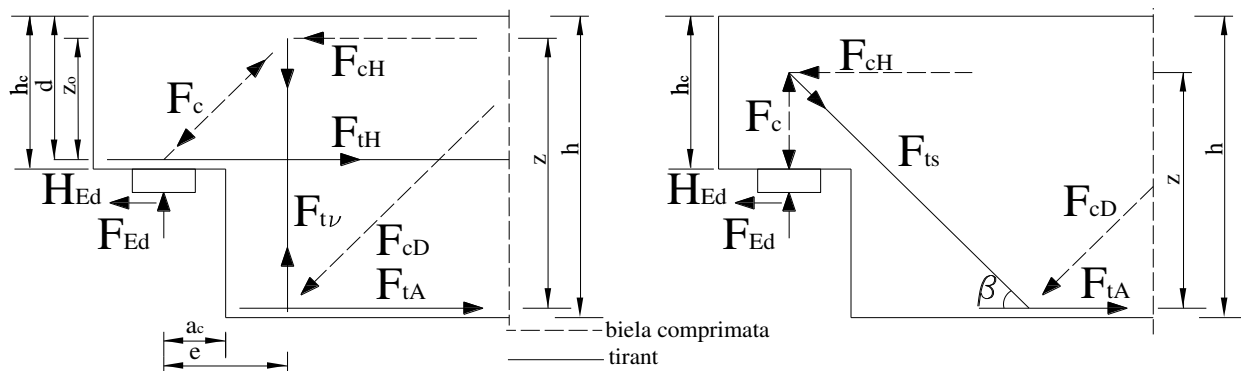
Strut and tie model for a support beam end with reduced cross section
